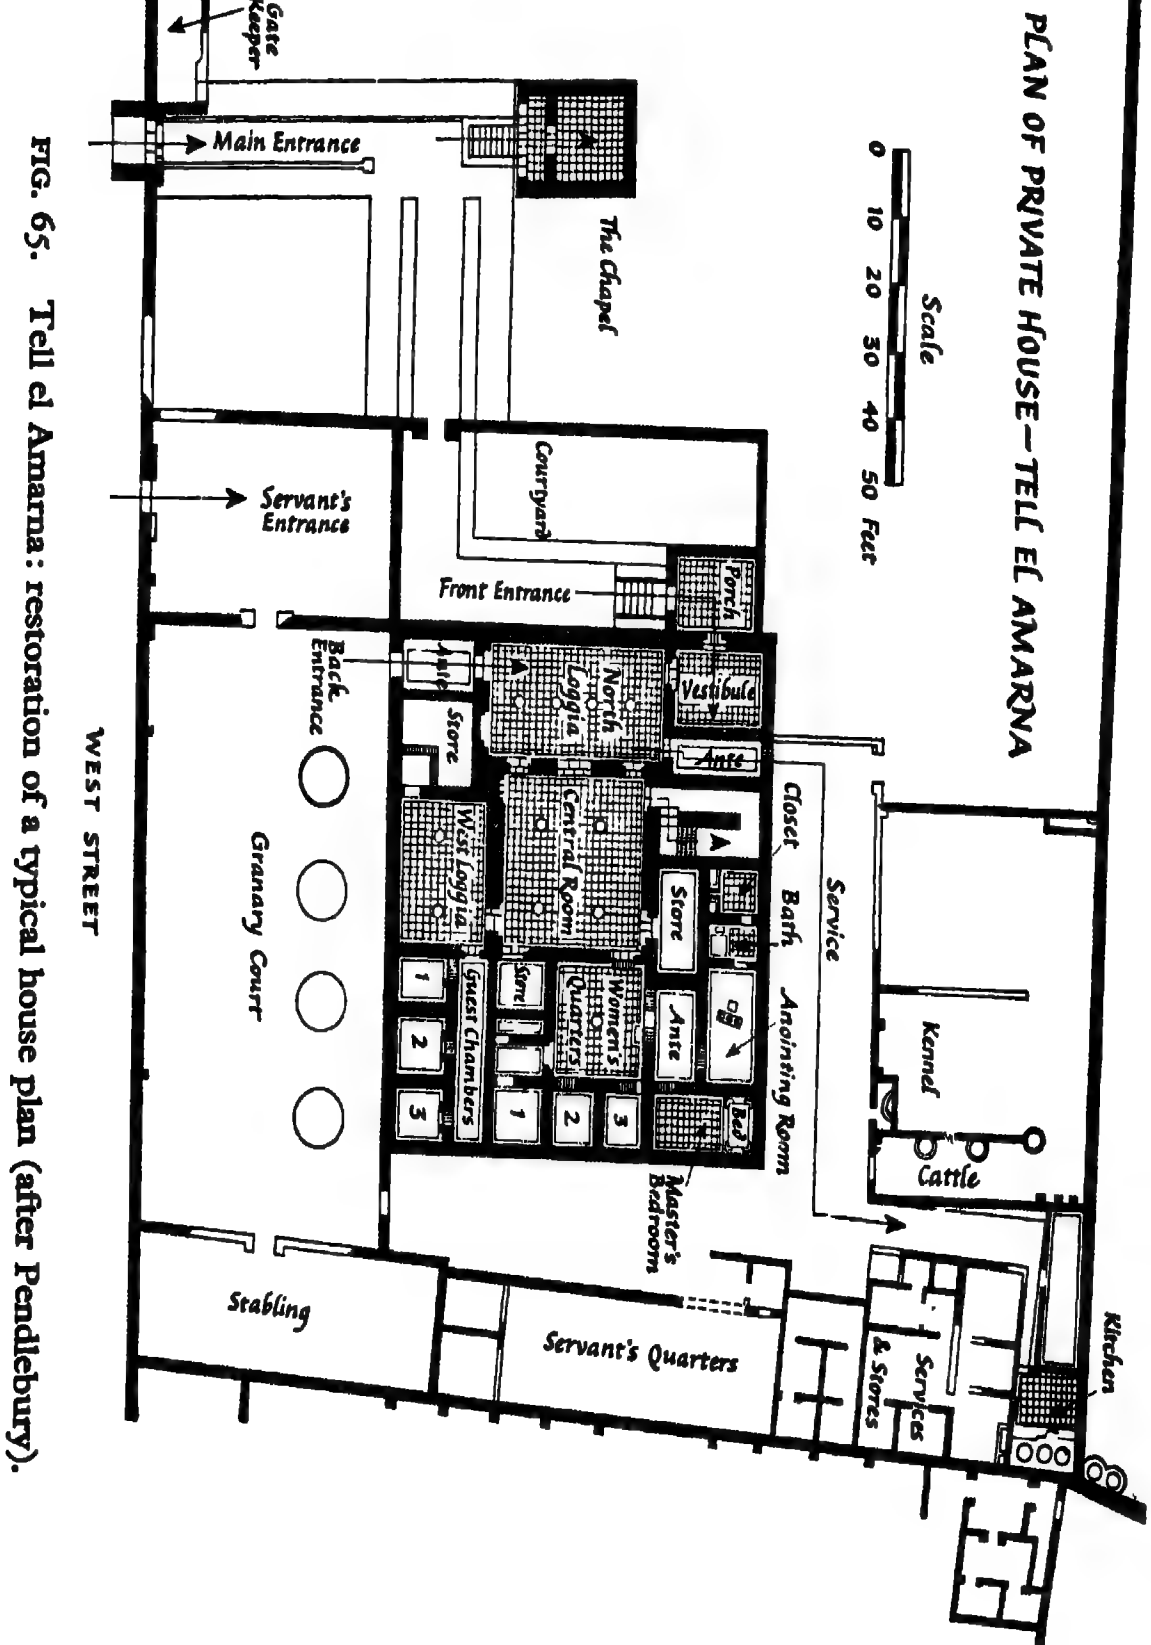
Tell el Amarna: restoration of a typical house plan (after Pendlebury).
